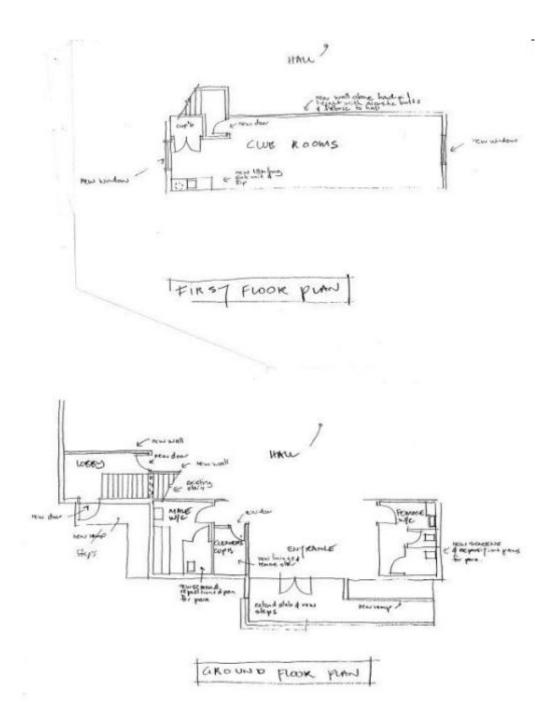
Plan Sketch Showing Ground/Mezzanine Floor Area as per 1992 Alterations
